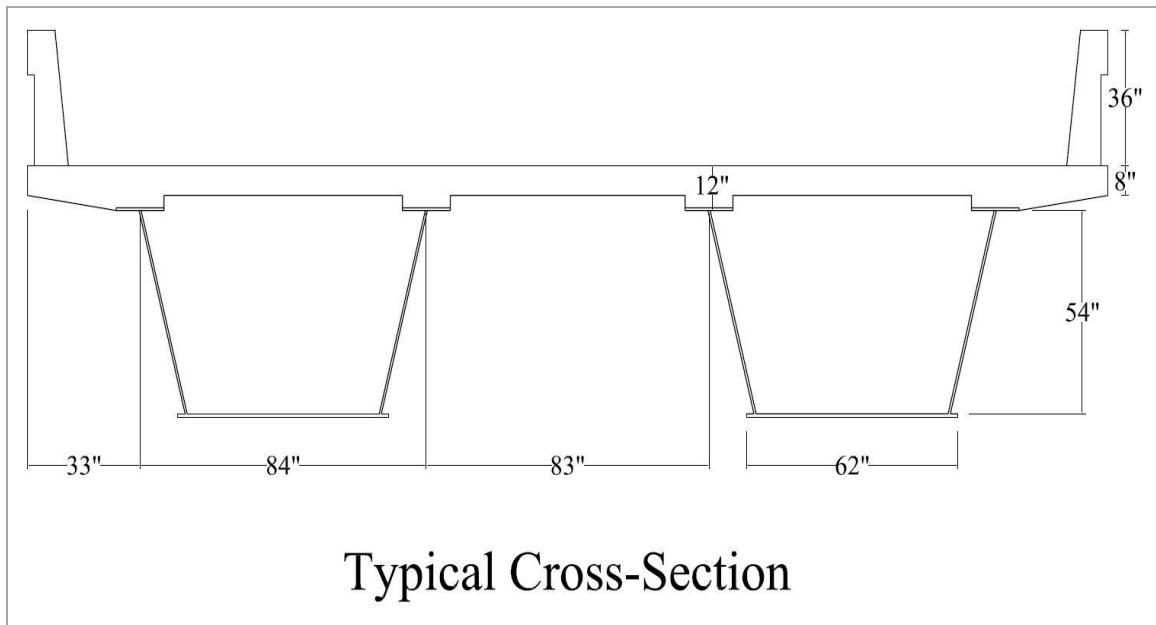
Typical cross-section of the Woodway Bridge Span 17 & 18
